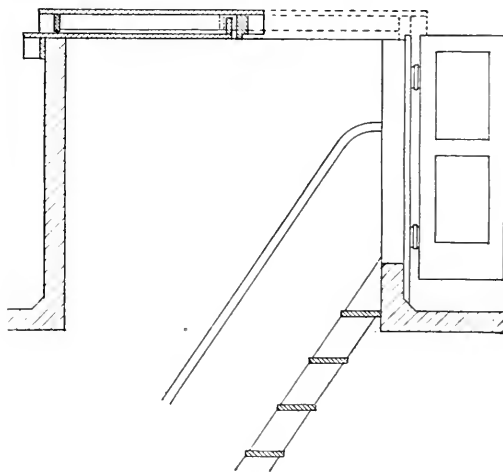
PENTHOUSE FOR STEEP STAIRS
